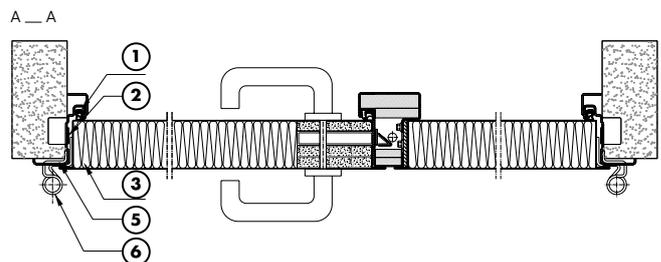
Horizontal cross-section of the fire-rated large-size double-leaf steel seamless door with a corner frame
